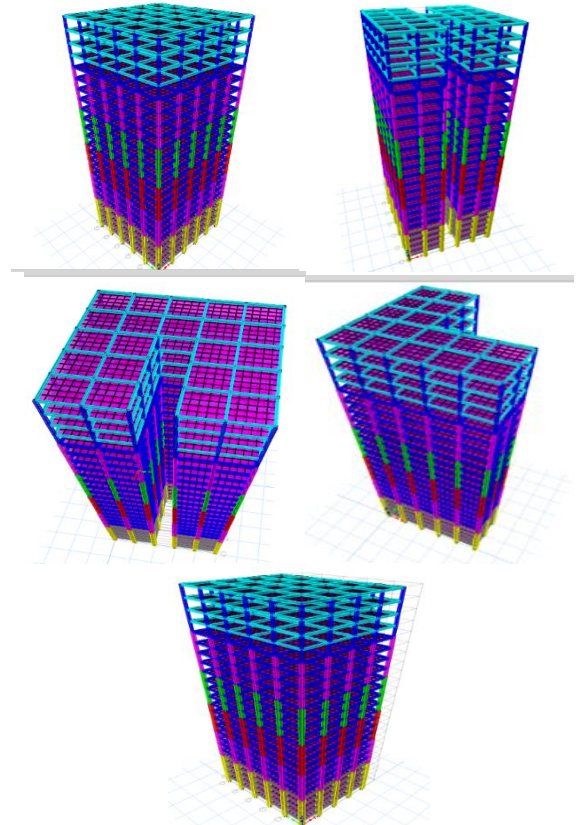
(a) SQUARE Shaped (b) H Shaped (c) L Shaped (d) C Shaped (e) Rectangle Shaped Building
